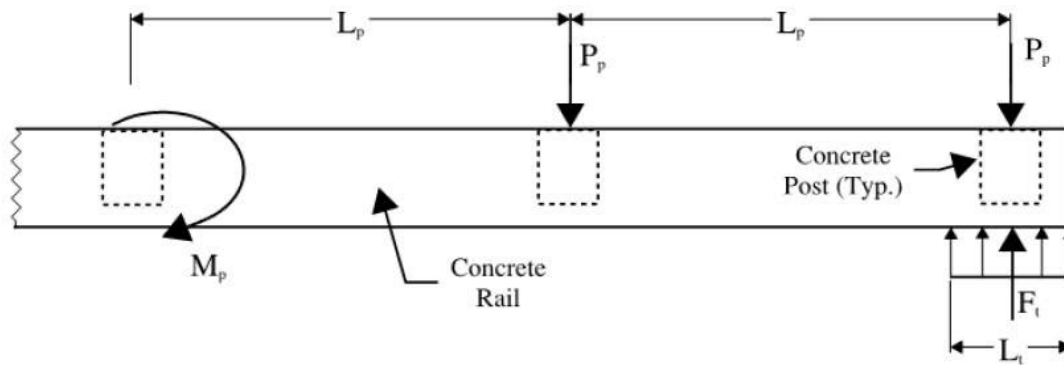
Two-Span Failure Mode for Post-and-Beam Railings at an End Section or Joint
